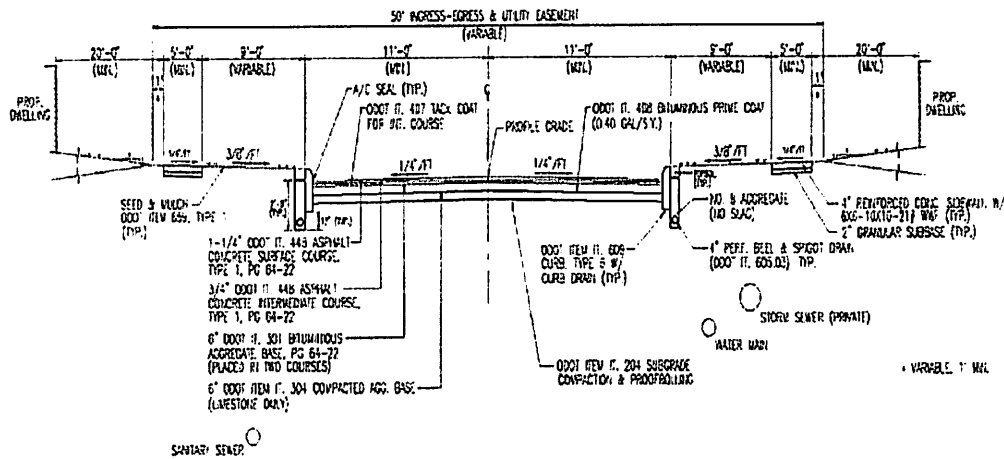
TYPICAL PRIVATE DRIVE SECTION (ALTERNATE - ASPHALT W/ CURB)
